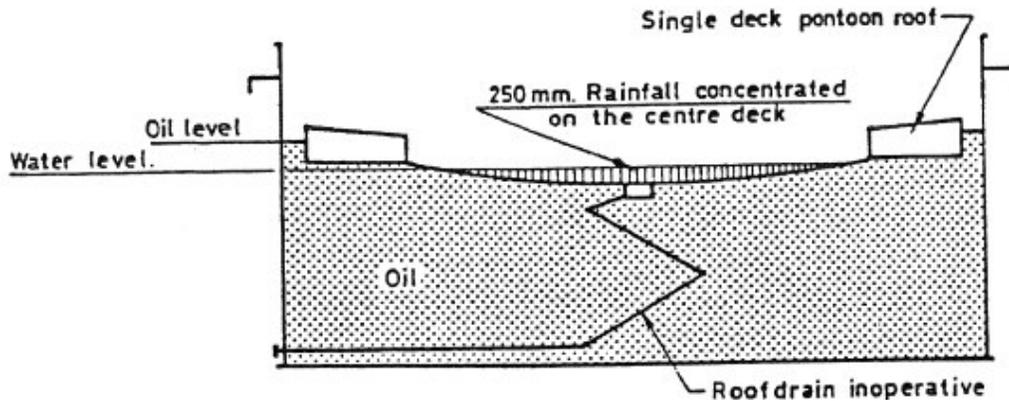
Minimum Requirement for Single Deck Pontoon Floating Roof [EEMUA 2003, vol.1, p118]
